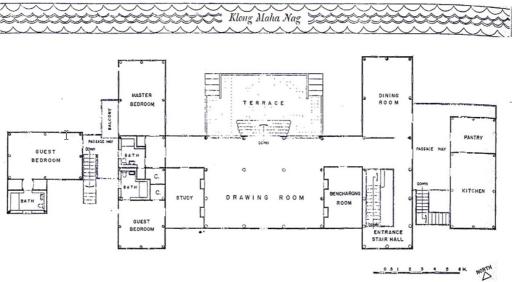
Floor plan of Jim Thompson's House Source: (Warren et al., 1999)
